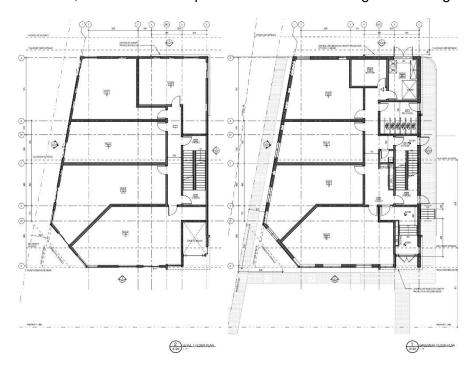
Ground Floor Plan (L) and Basement Floor Plan (R)
